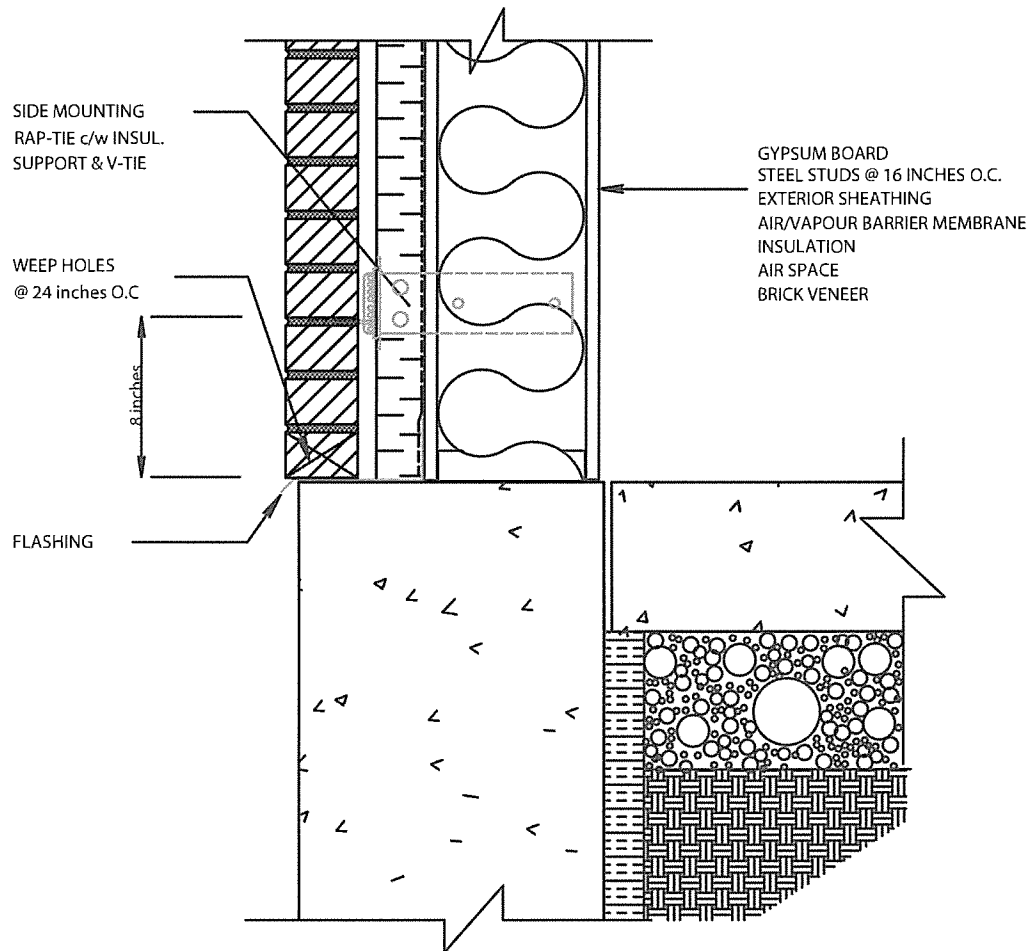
BRICK VENEER / STEEL STUD - AT FOUNDATION
